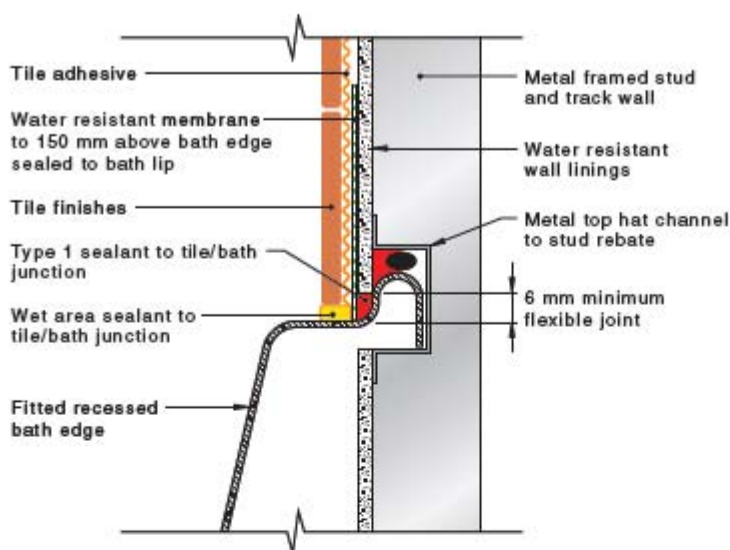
(C) — Bath with no shower over it — Fitted bath — Metal framed wall
